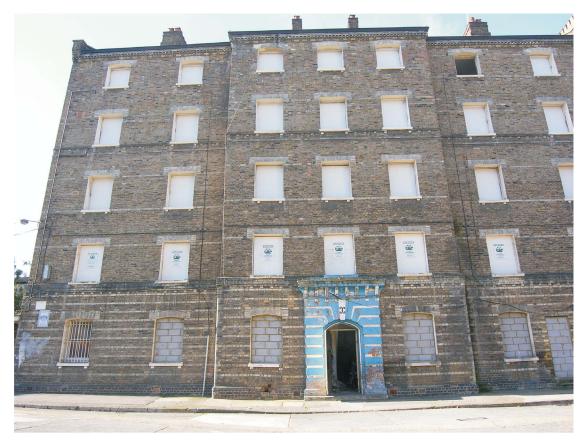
Looking west toward the eastern elevation of Block  $\boldsymbol{X}$
